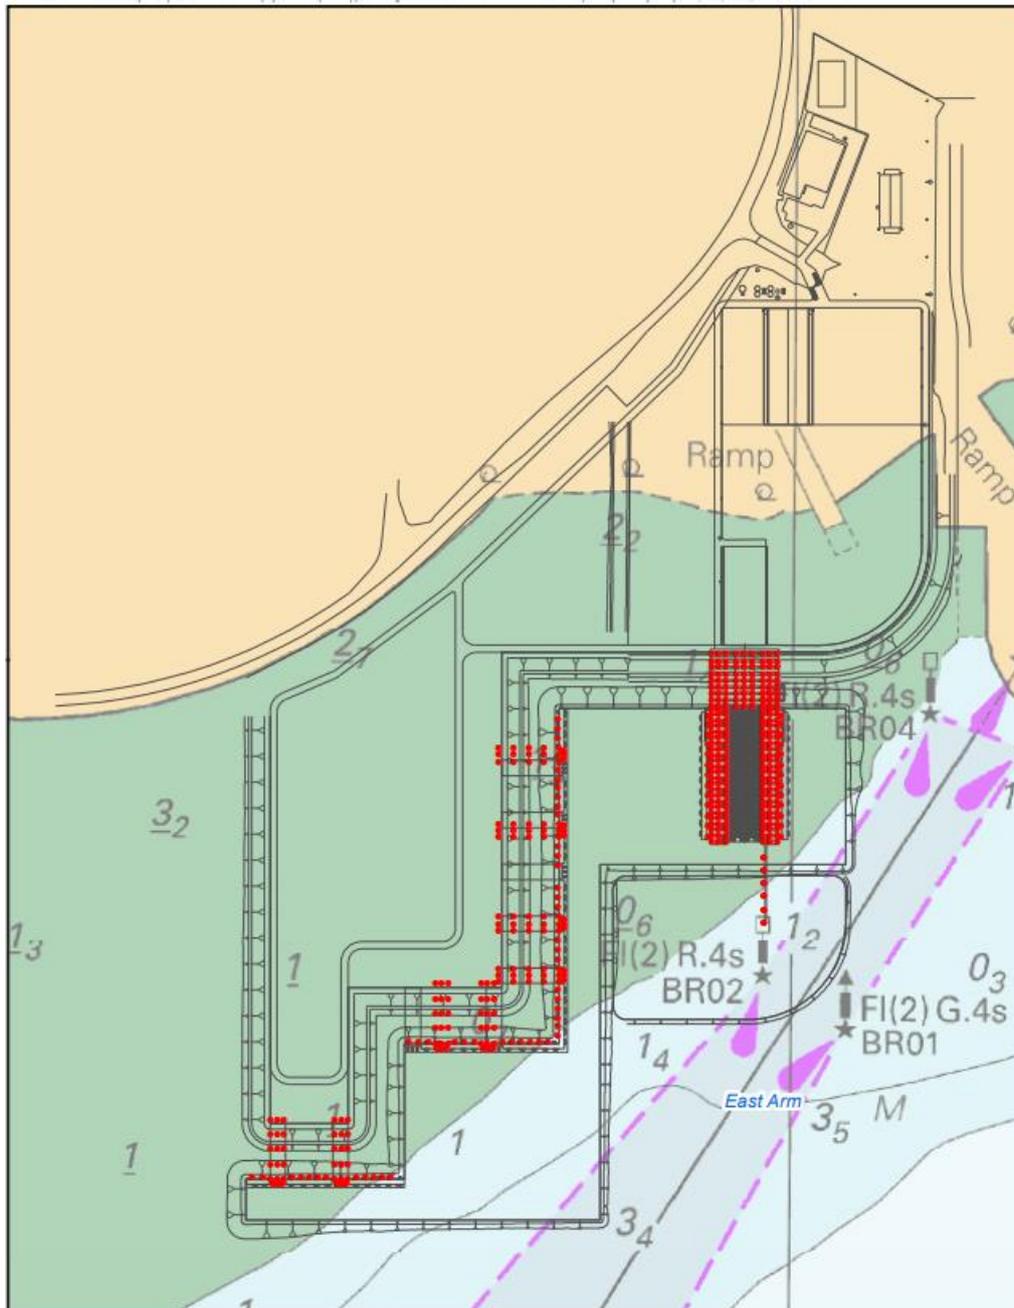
SLAMI Pile Design and Configurations (source: SMEC 15/09/2020)
